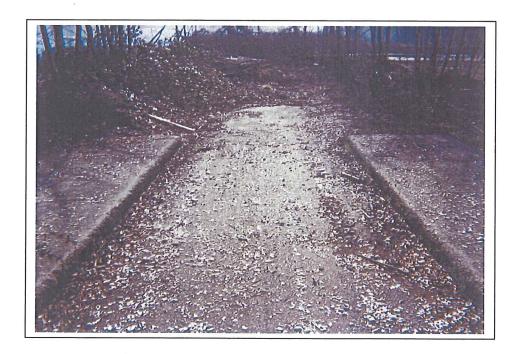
Concrete pad appears to be a containment pad for railroad cars, facing south (2/12/04).
